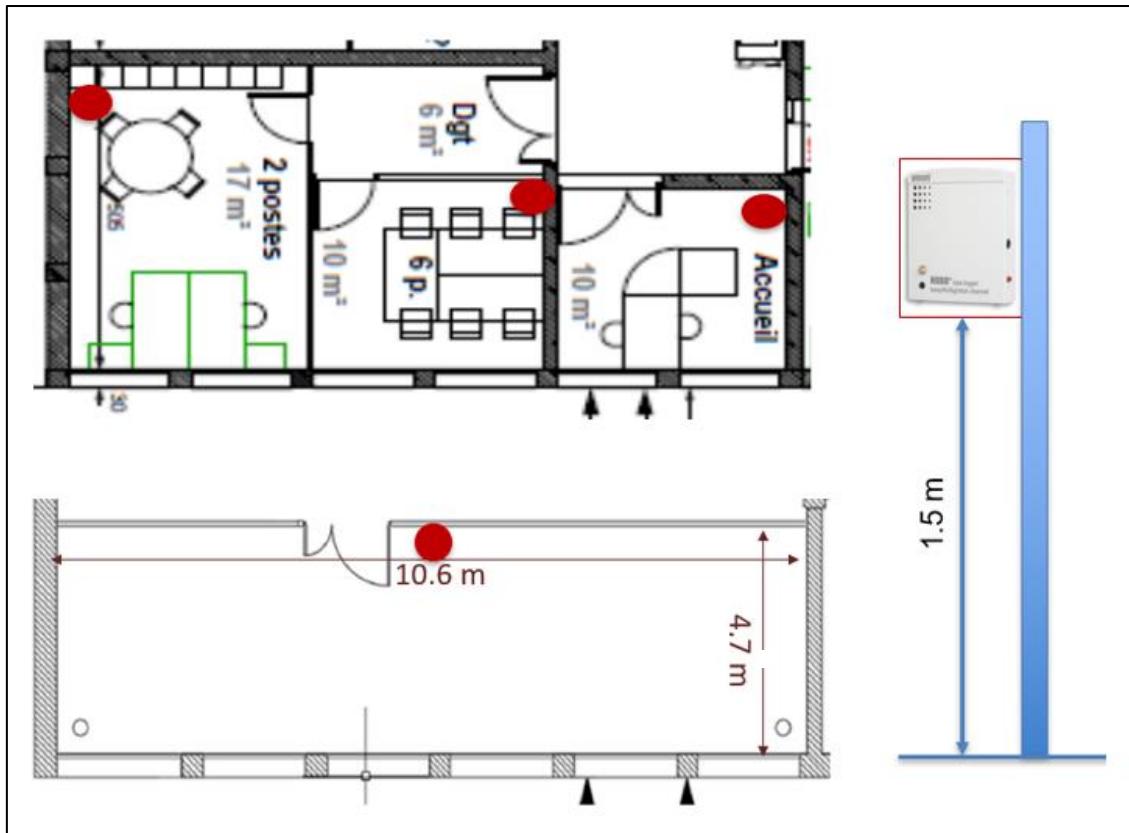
Location of hobos in the 1st floor (top), and in the ground floor (bottom)
